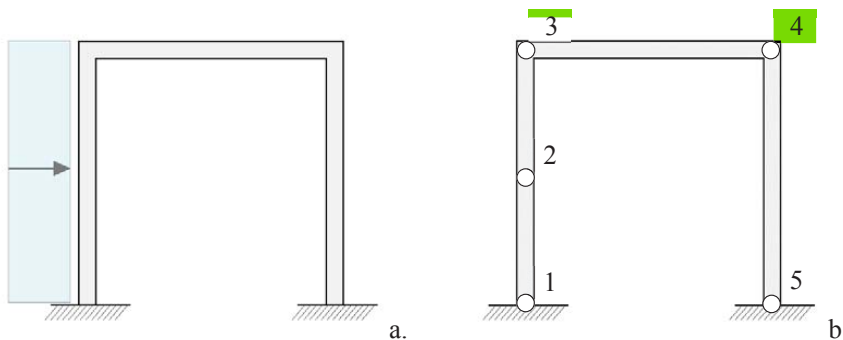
Concrete frame structure subjected to blast loading (a) and locations and labeling of plastic hinges (b).
